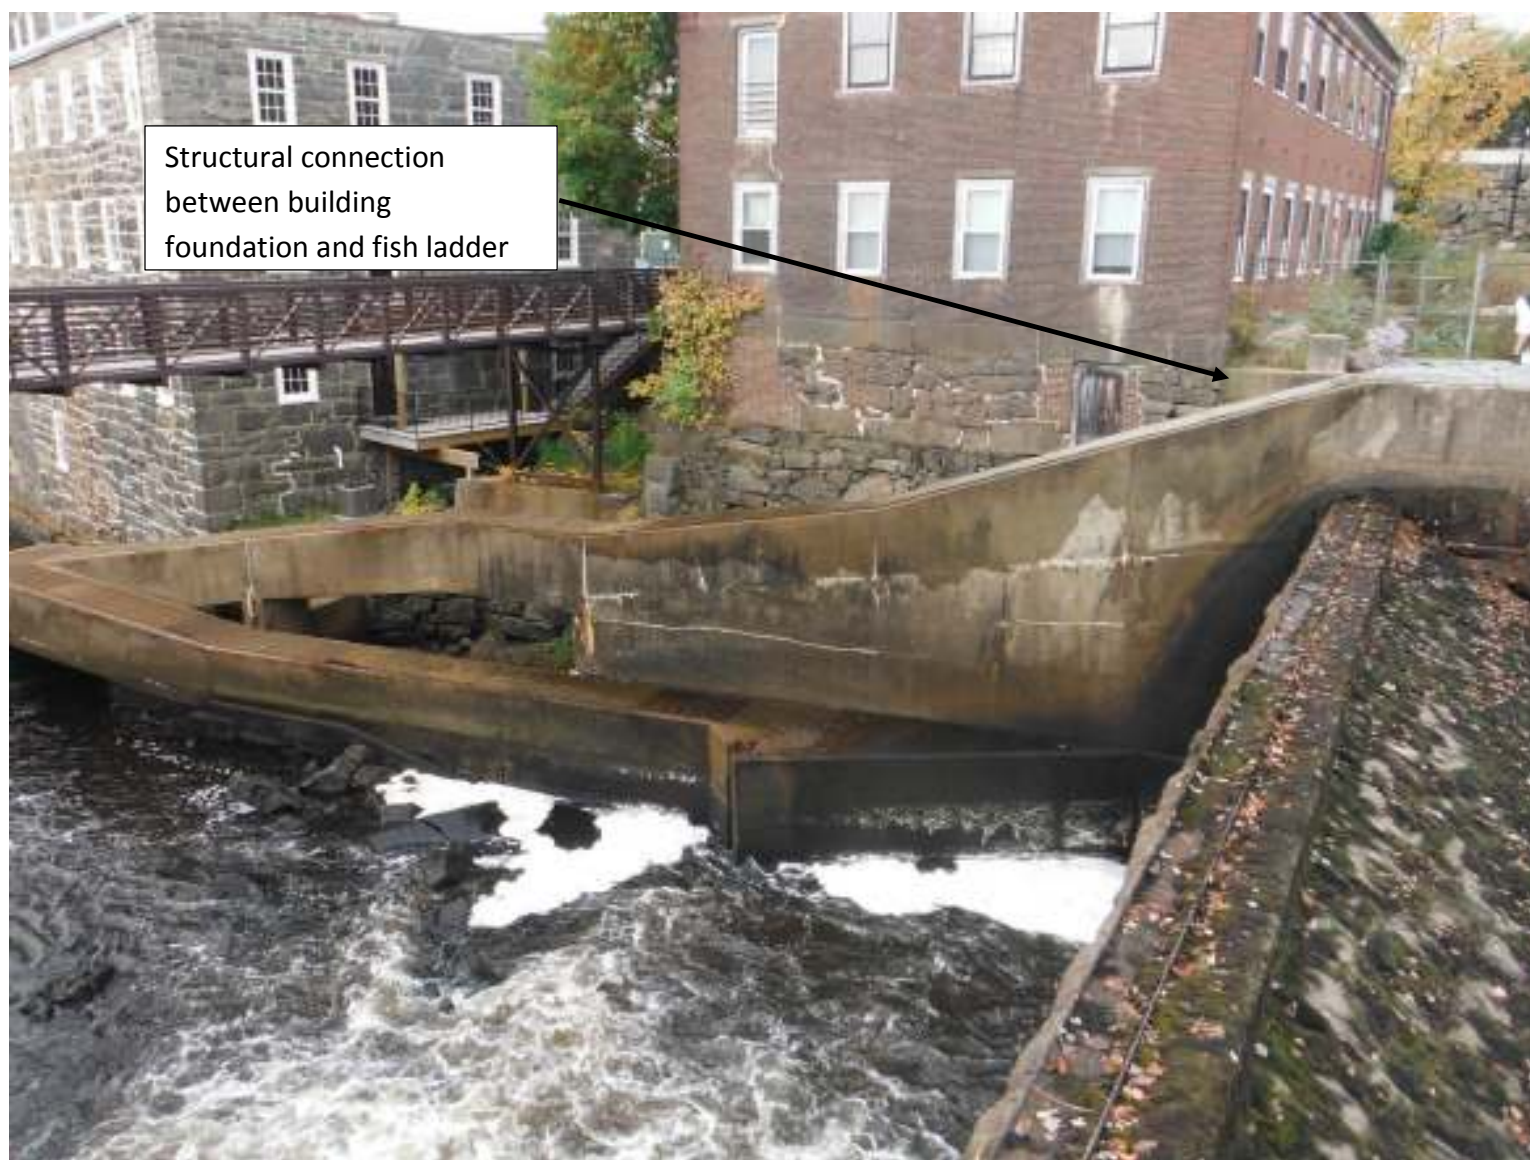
Photograph of the right abutment showing the connection between the fish ladder and the building on the right abutment.
